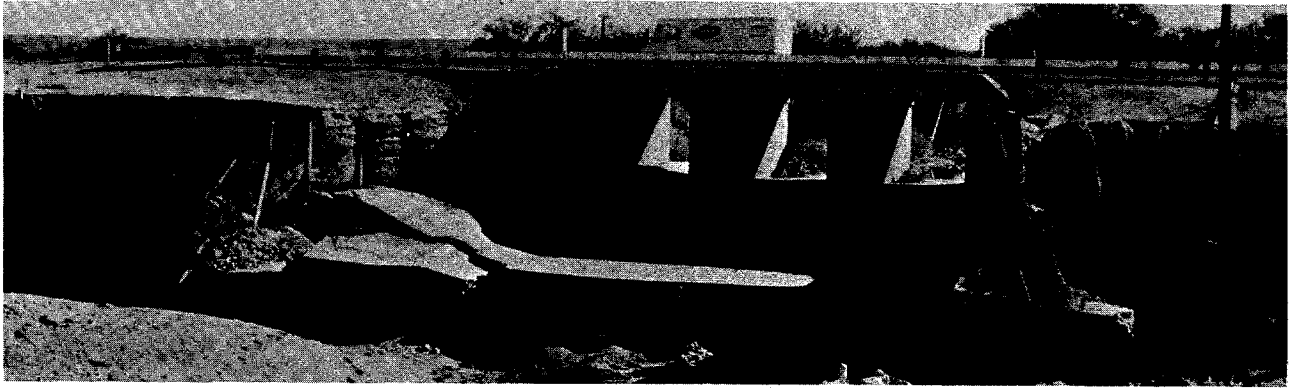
Channel degradation and concrete apron damage at downstream side of bridge in 1971. The concrete apron was added in 1969. (From Arizona Dept. of Highways.)
